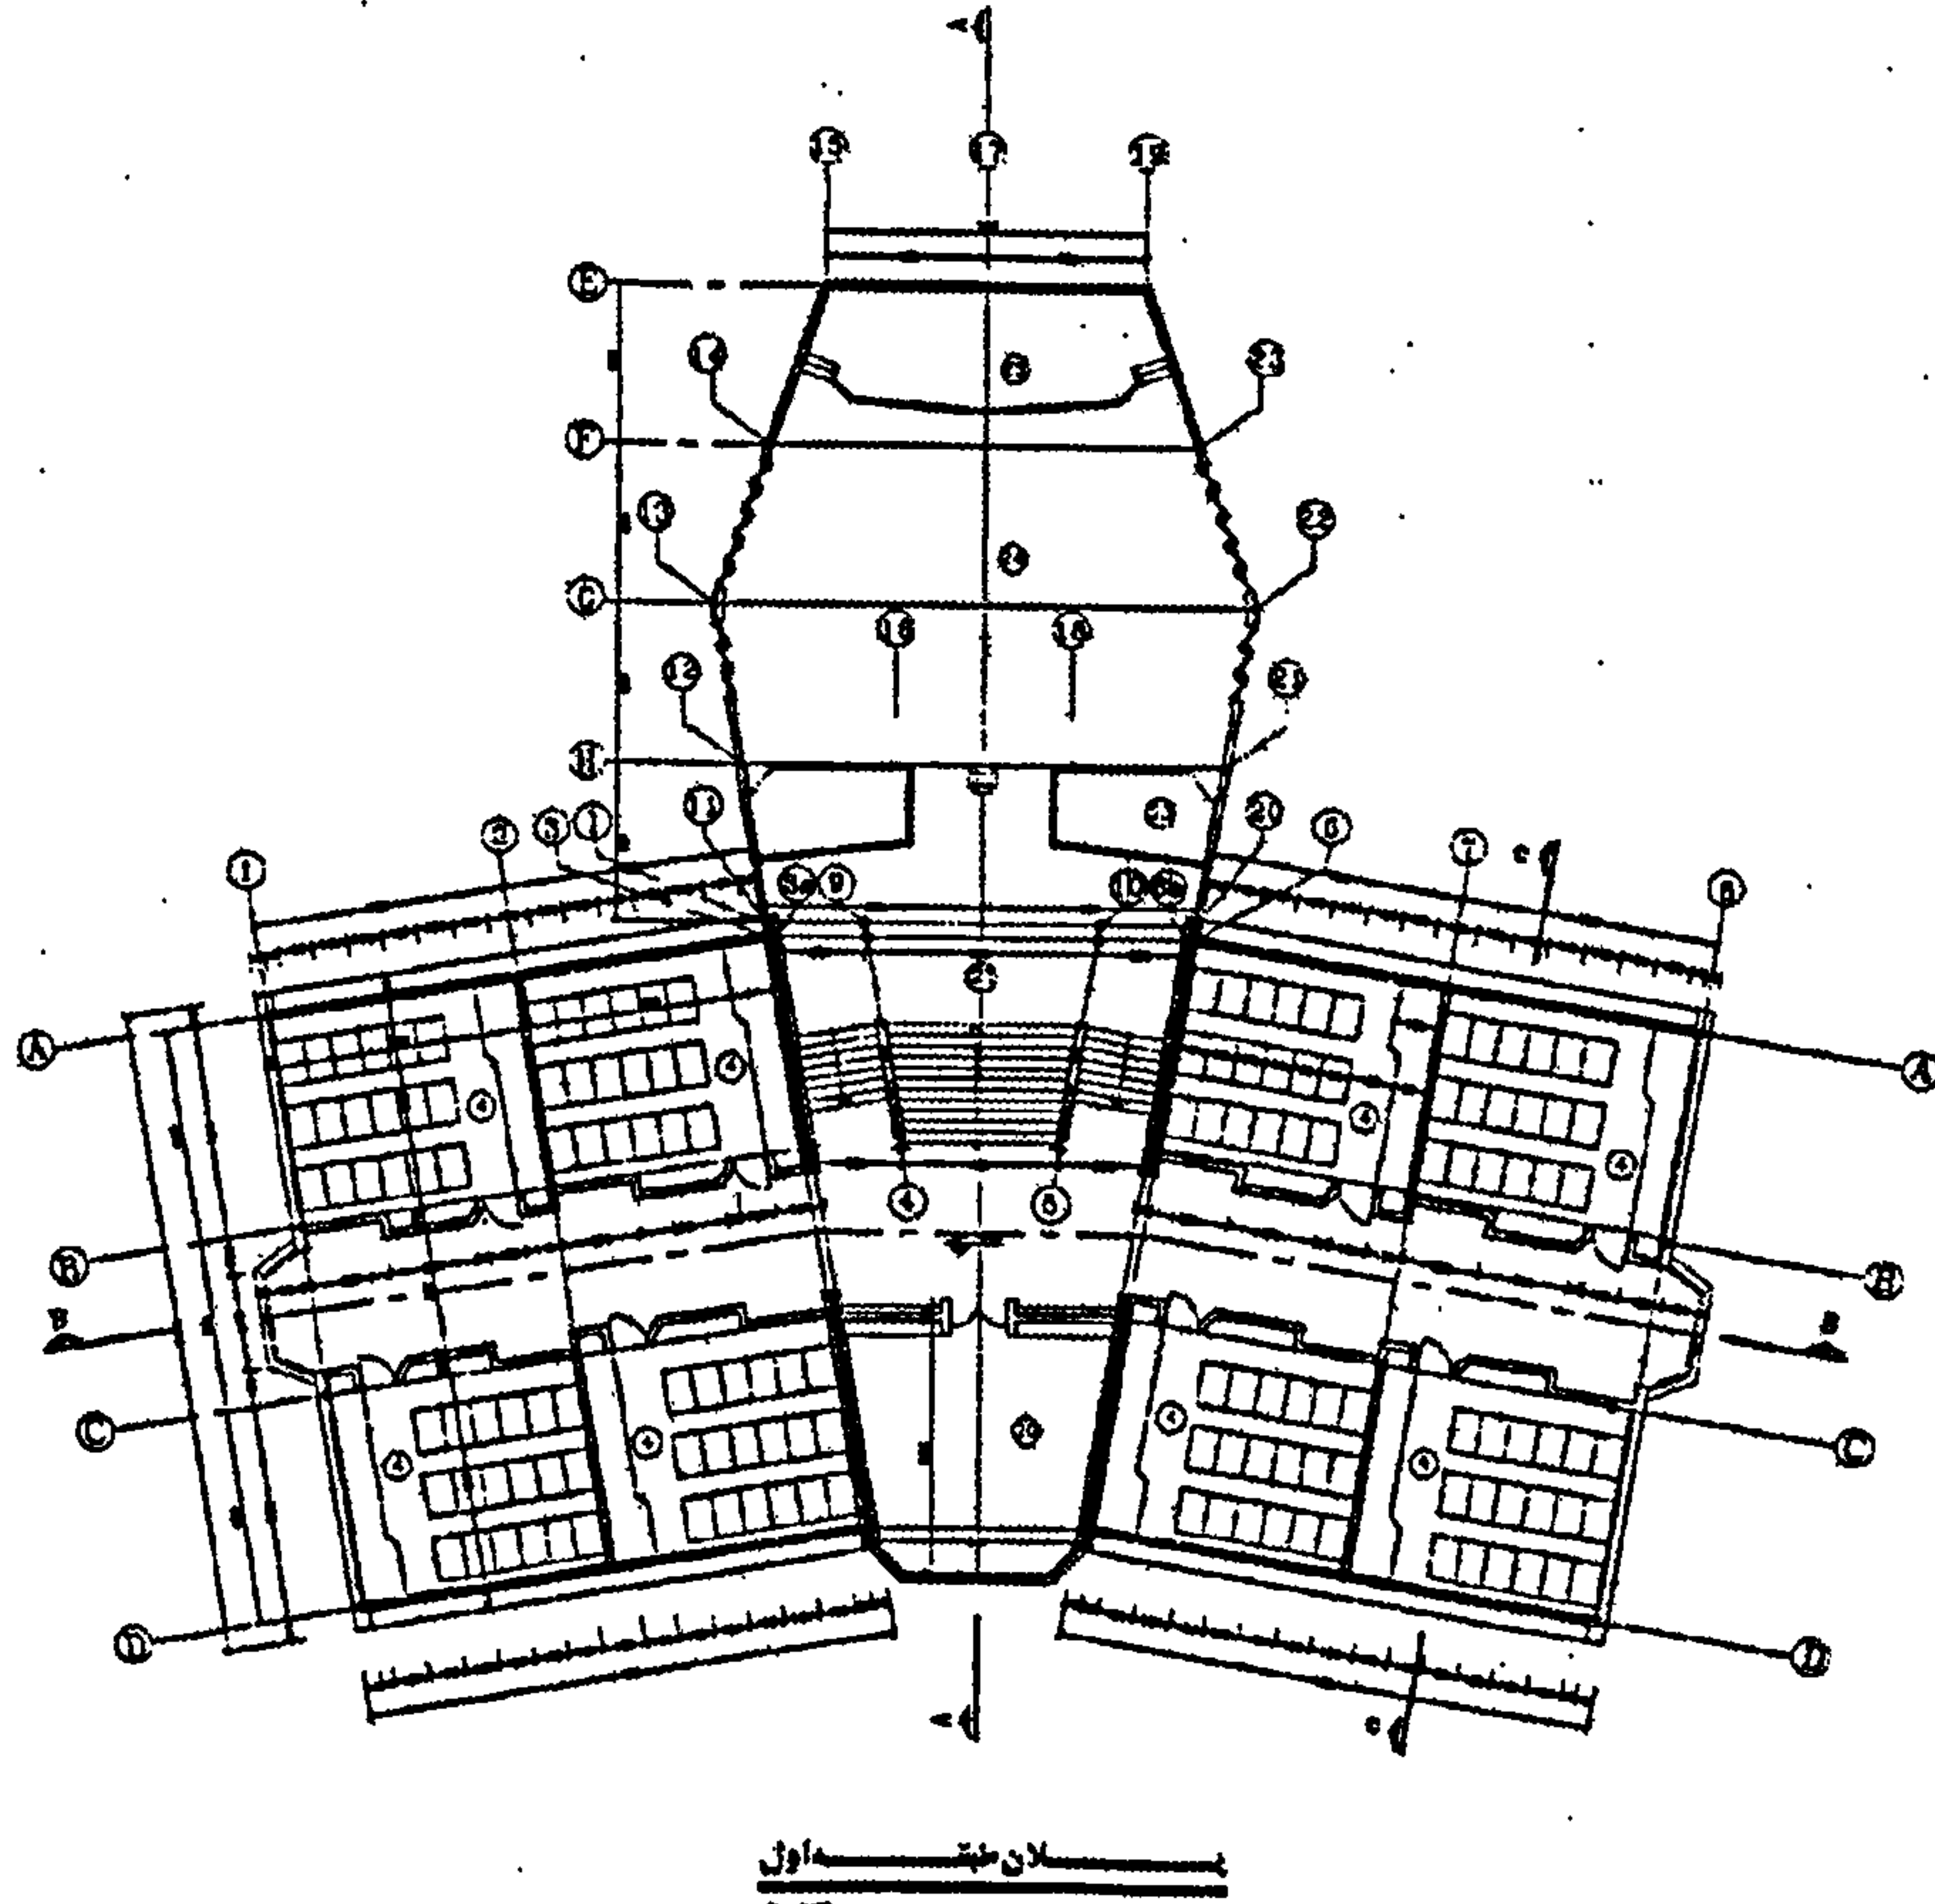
The plan of the second floor of a primary school with 20 classrooms (Number 1)
